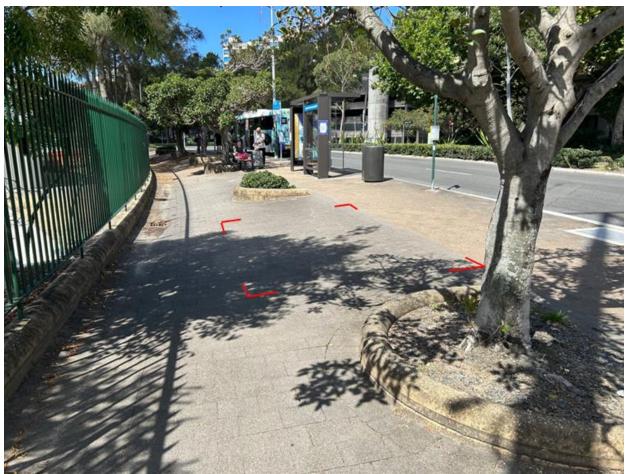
Site viewed facing north, with approximate markings of the proposed APT location and size shown in red. Bus stop shown in the background.
